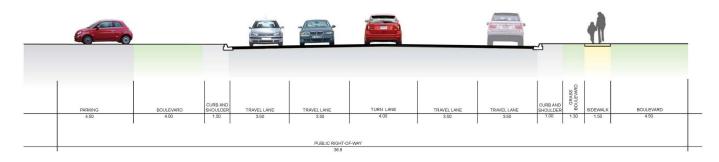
Existing Cross Section Between Railway Bridge and Ellwood Drive
